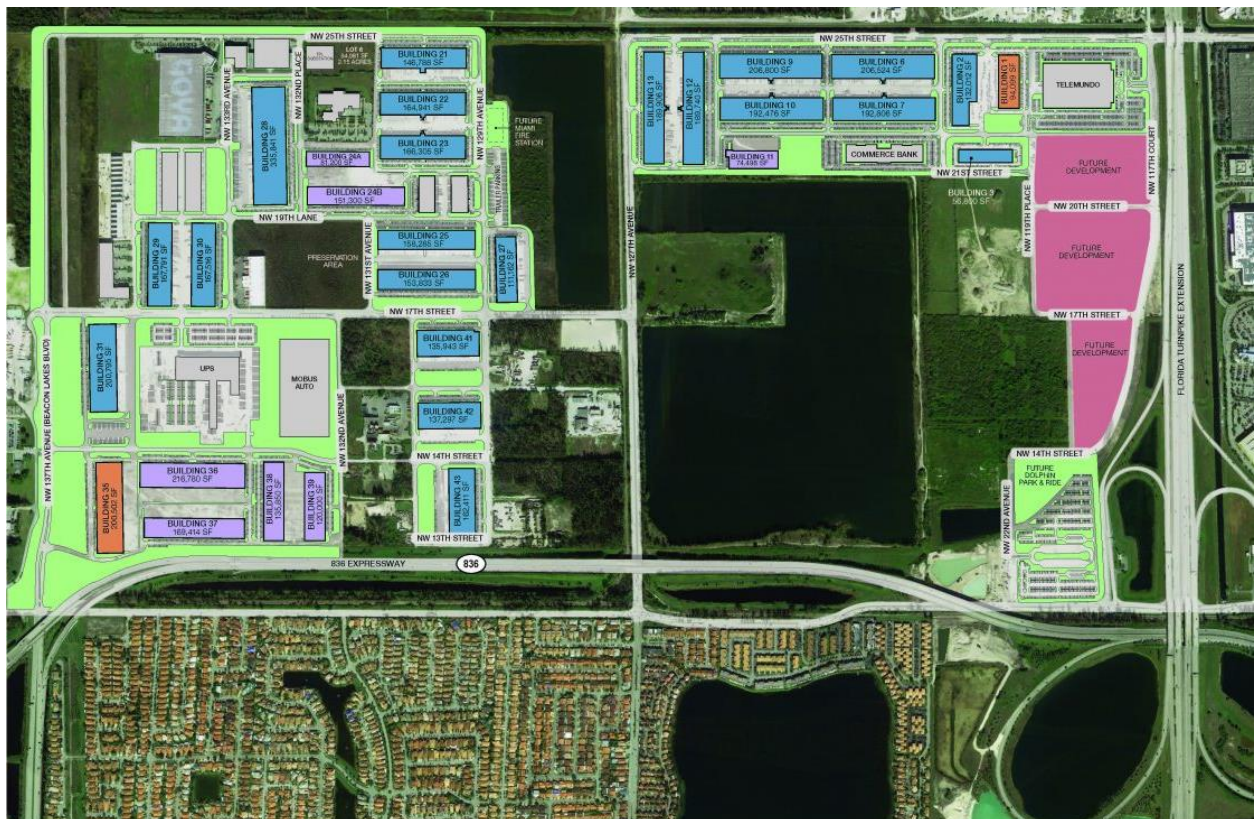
Planned Development around the Dolphin Park-and-Ride Station
